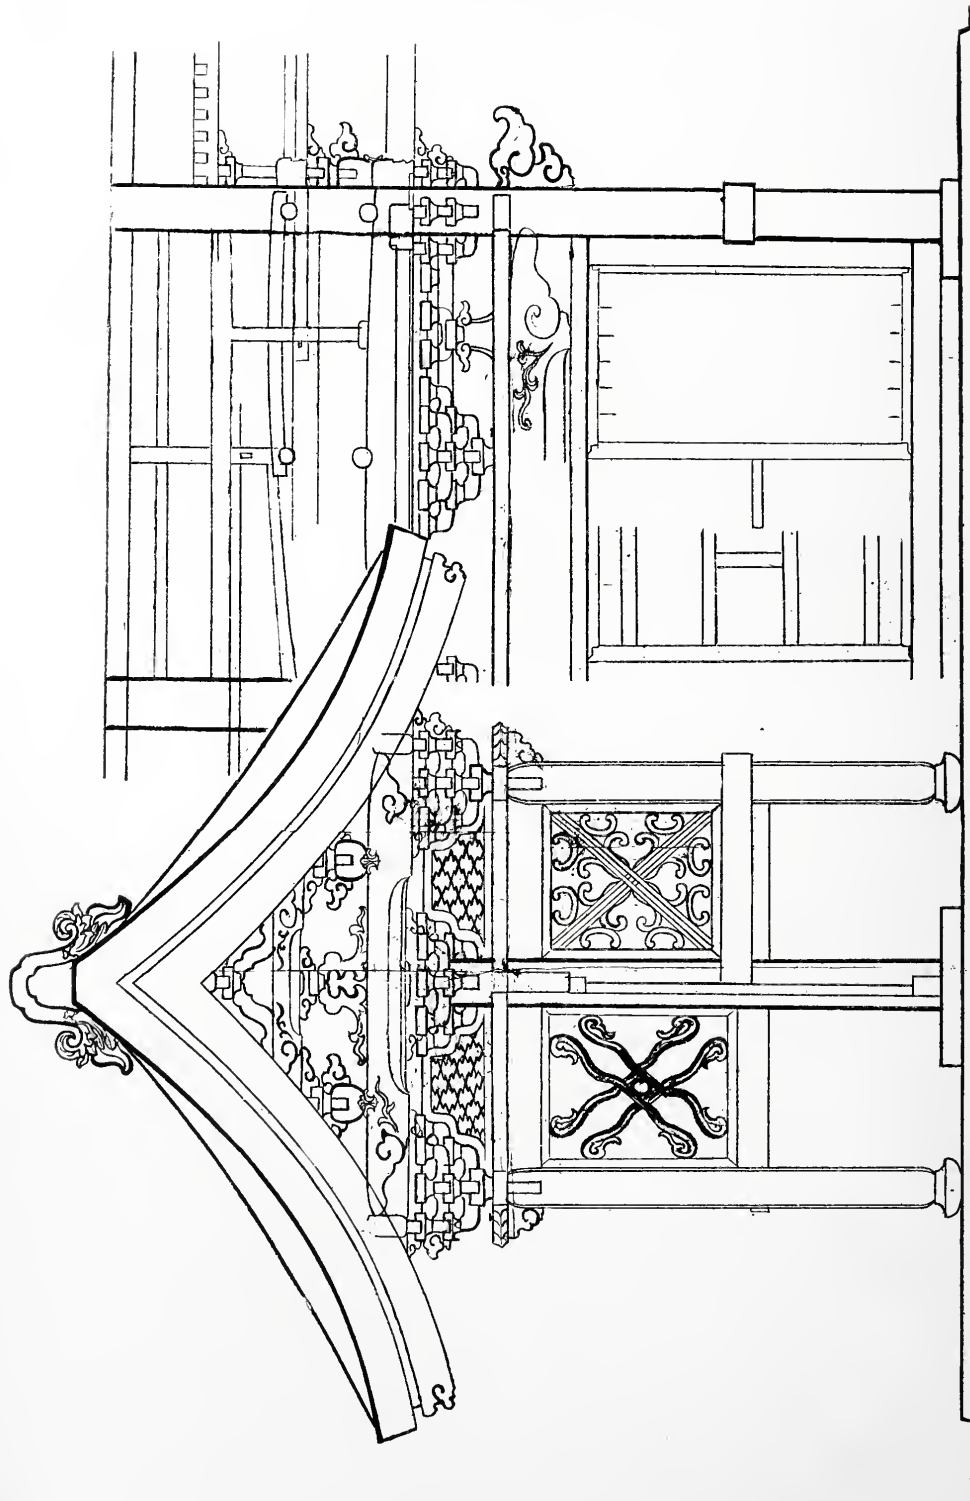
FRONT AND SIDE ELEVATION OF A JAPANESE TEMPLE—WORKING DRAWING.
